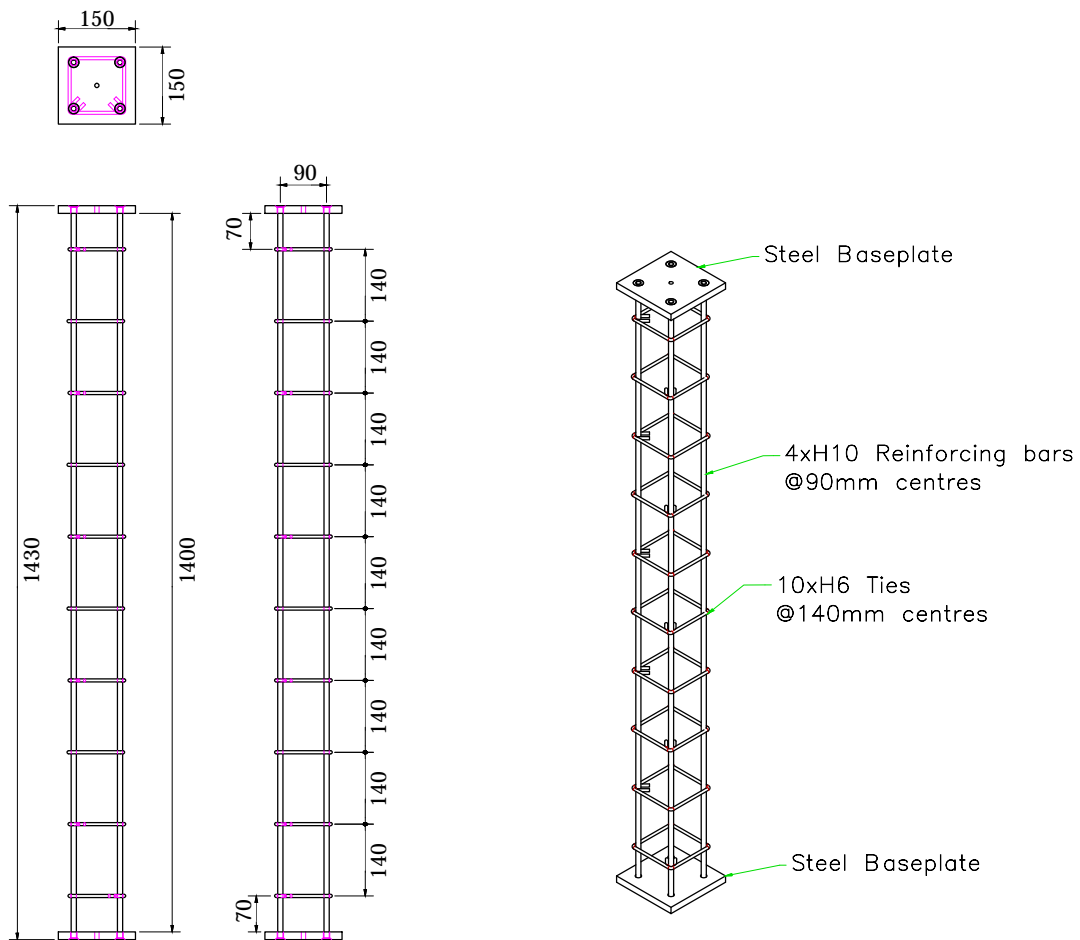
Schematic of reinforcement cage for the concrete columns cast
